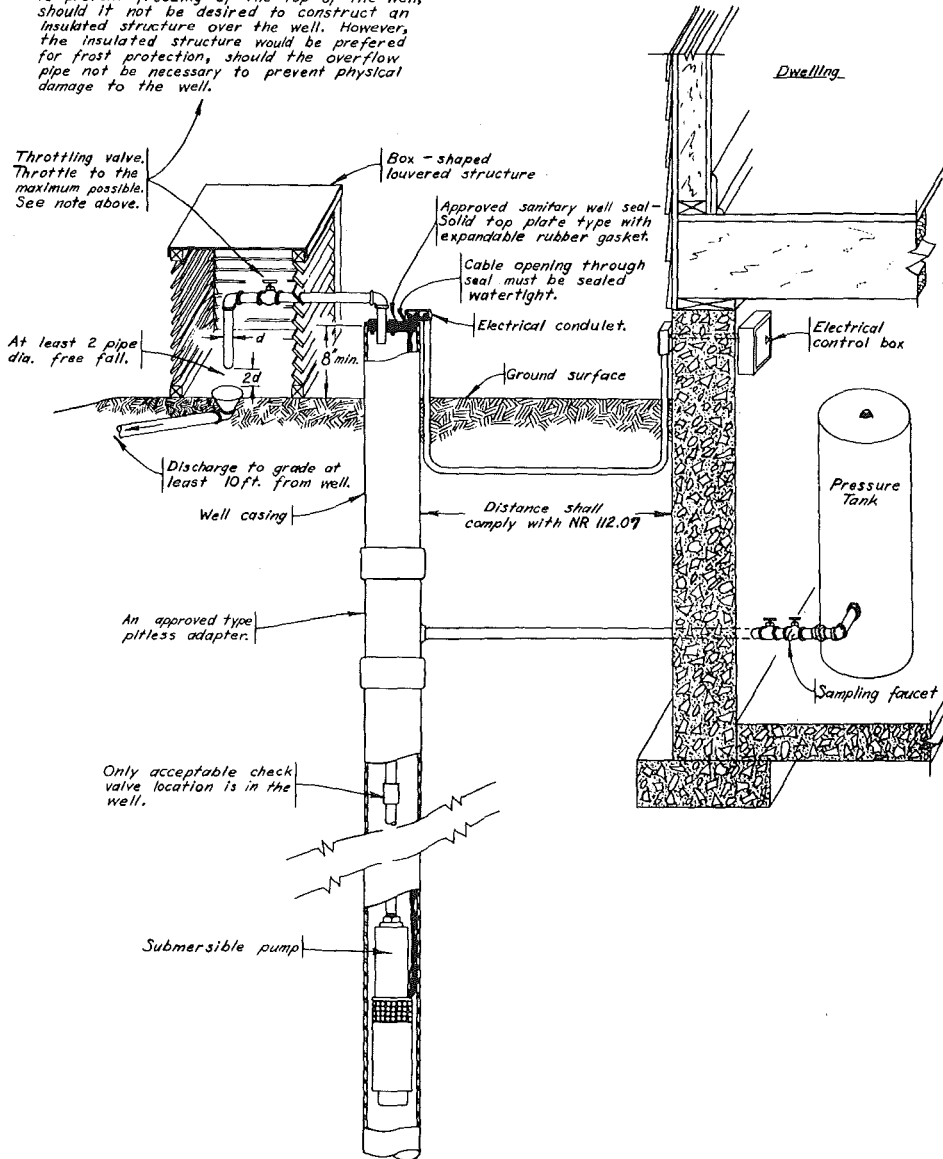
Pump Installation for Flowing Well using an Approved Pitless Adapter and Submersible Pump and Overflow Provision, if necessary.
